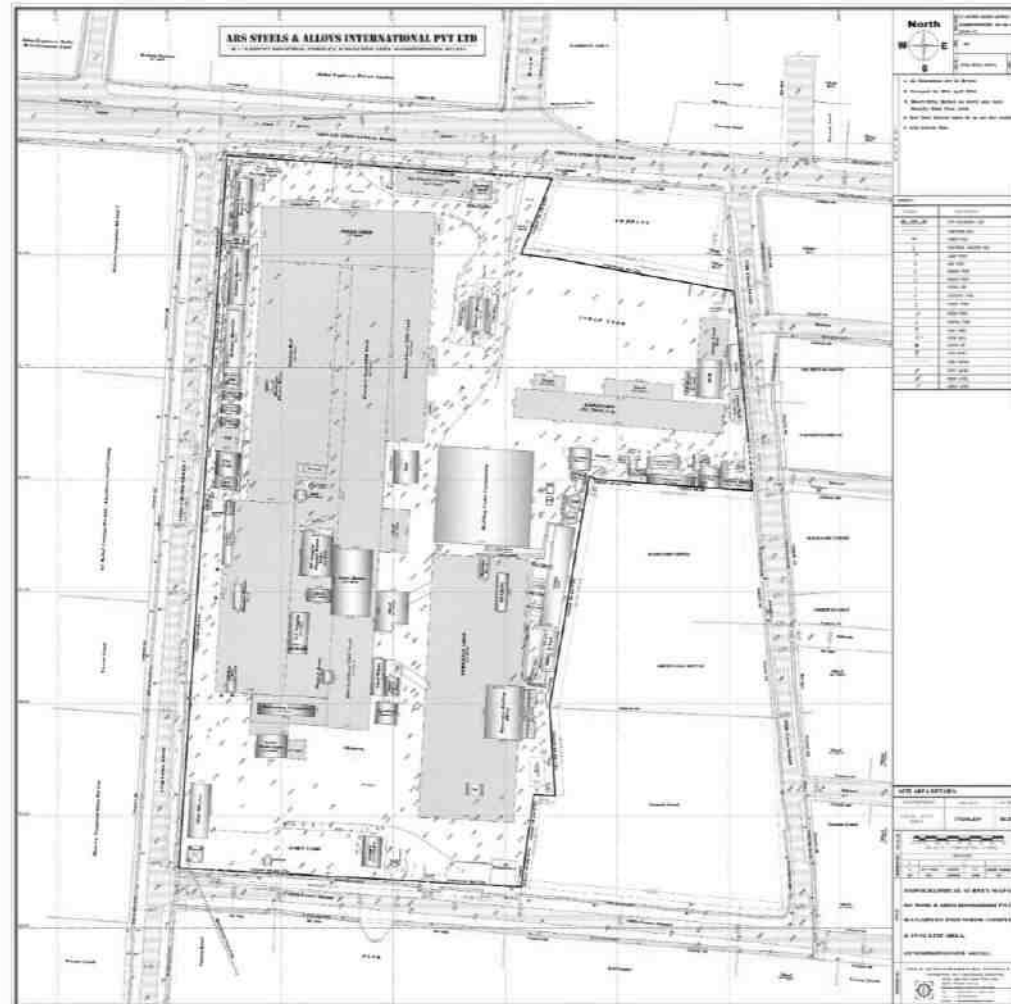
PLANT LAYOUT OF THE PROJECT
